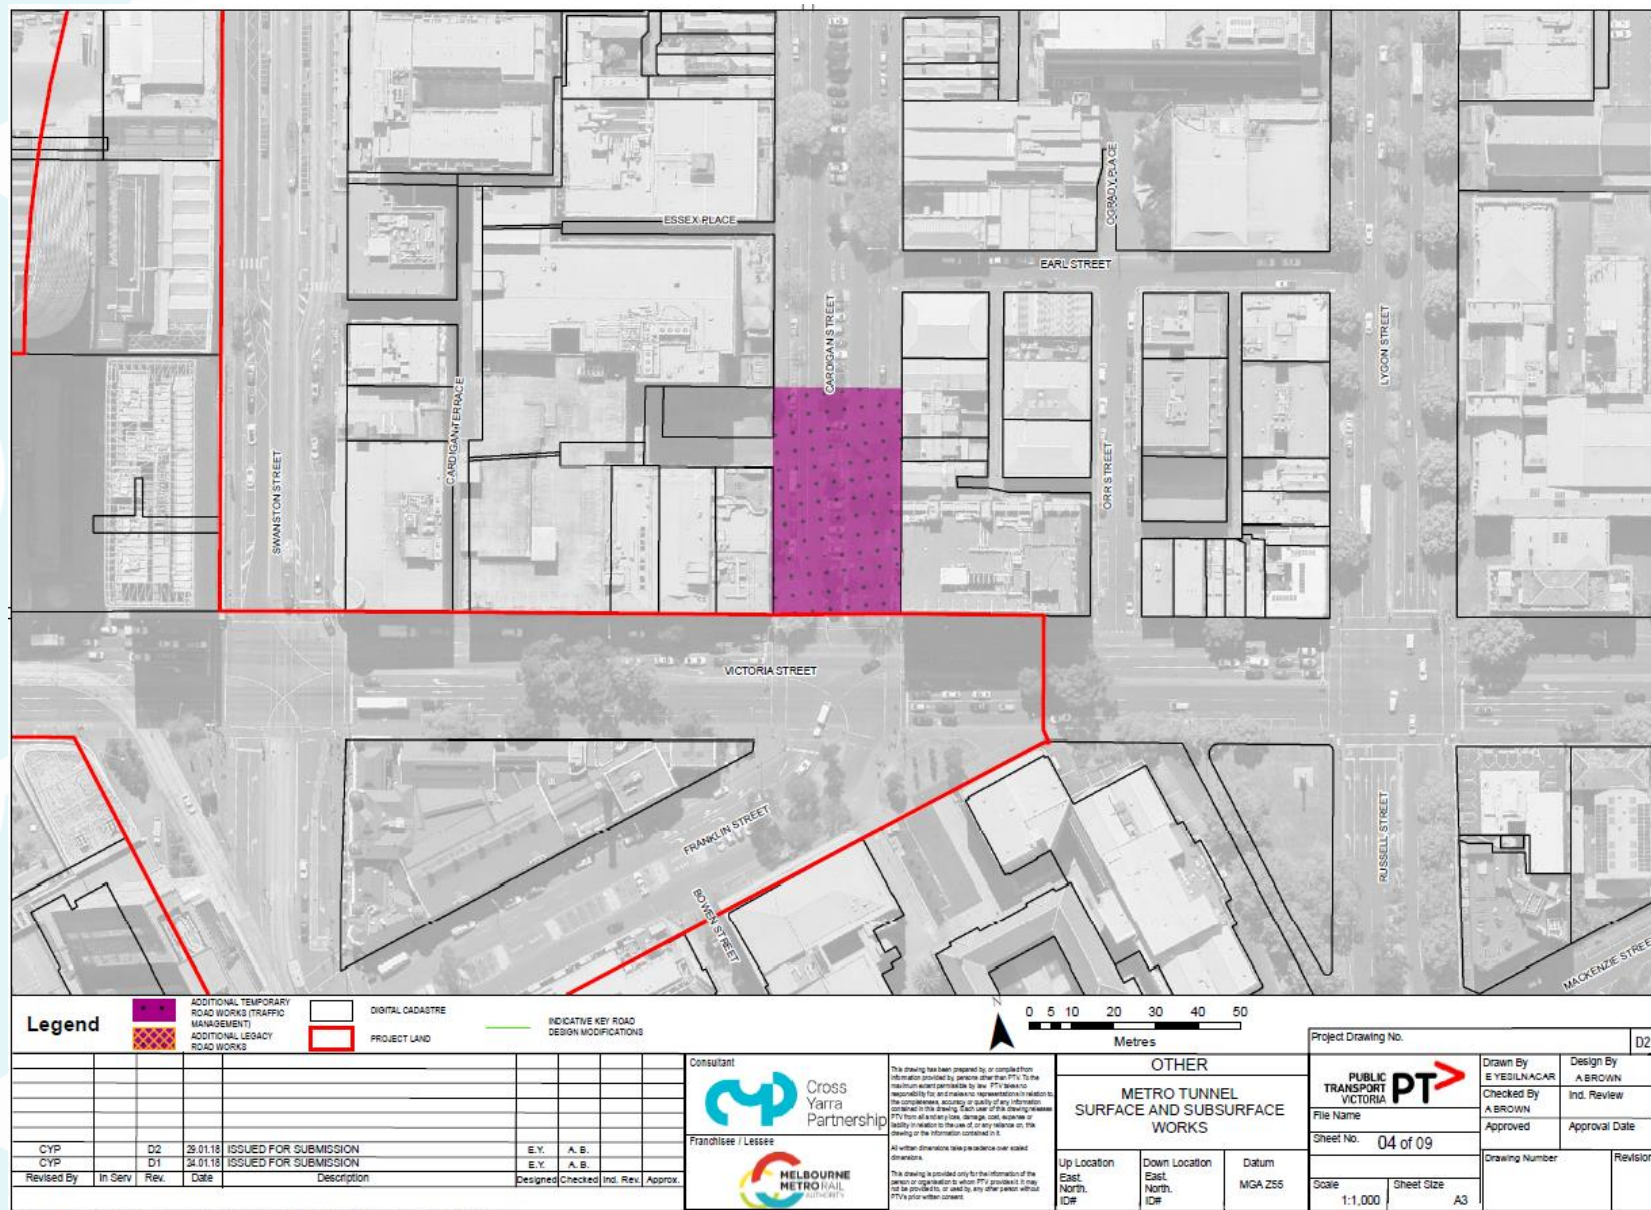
CARDIGAN STREET ADDITIONAL ROAD SURFACE WORKS
